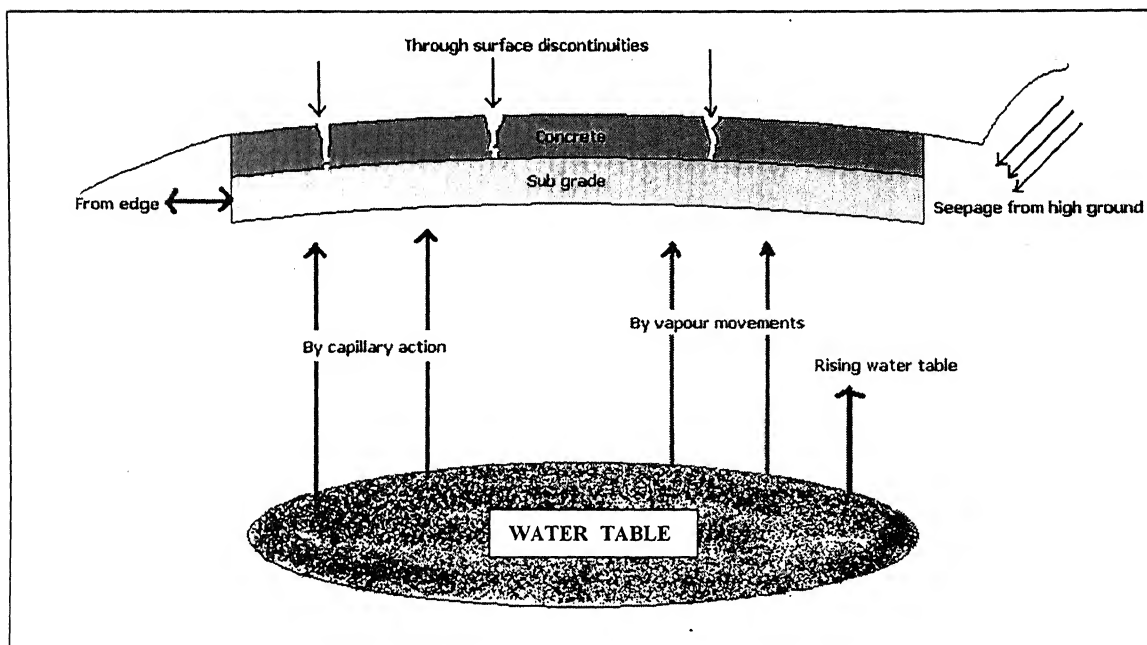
Schematic diagram showing the ingress of moisture into the pavement (AASHTO, 2002)
